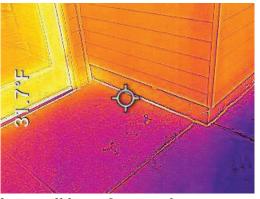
&5 SW Upper Classroom Entry – some heat transfer at wall base. Open grade near overhang – has waterproofing degraded here?
